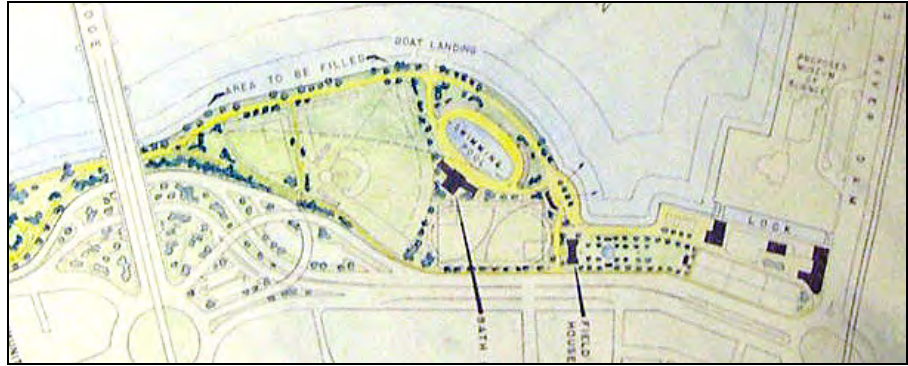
Detail of preliminary 1949 plan. The design was changed somewhat when the Lee Pool was built in 1951. (DCR archives)
